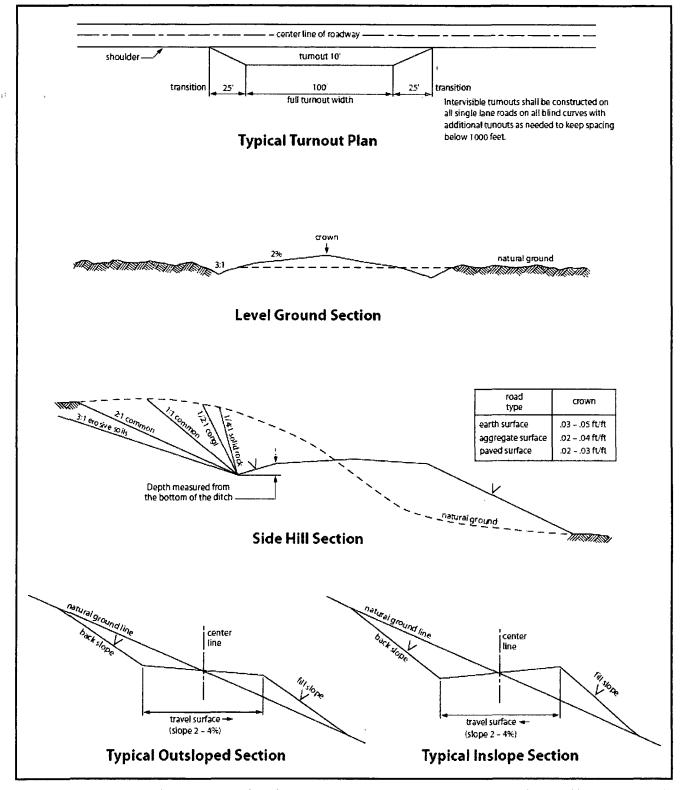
Cross-sections and plans for typical road sections representative of BLM resource or FS local and higher-class roads.
